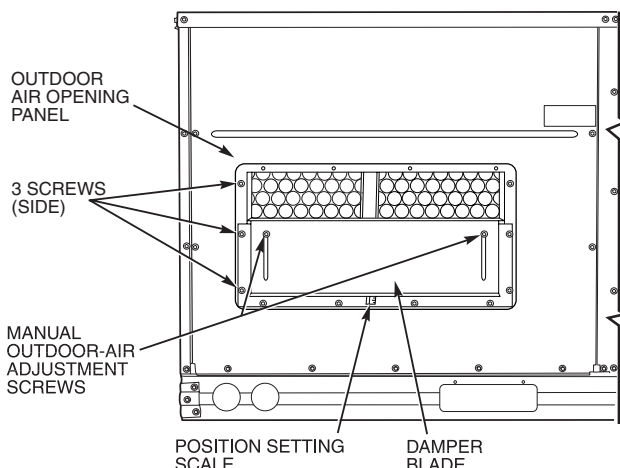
Damper Panel with Manual Outdoor-Air Damper Installed
